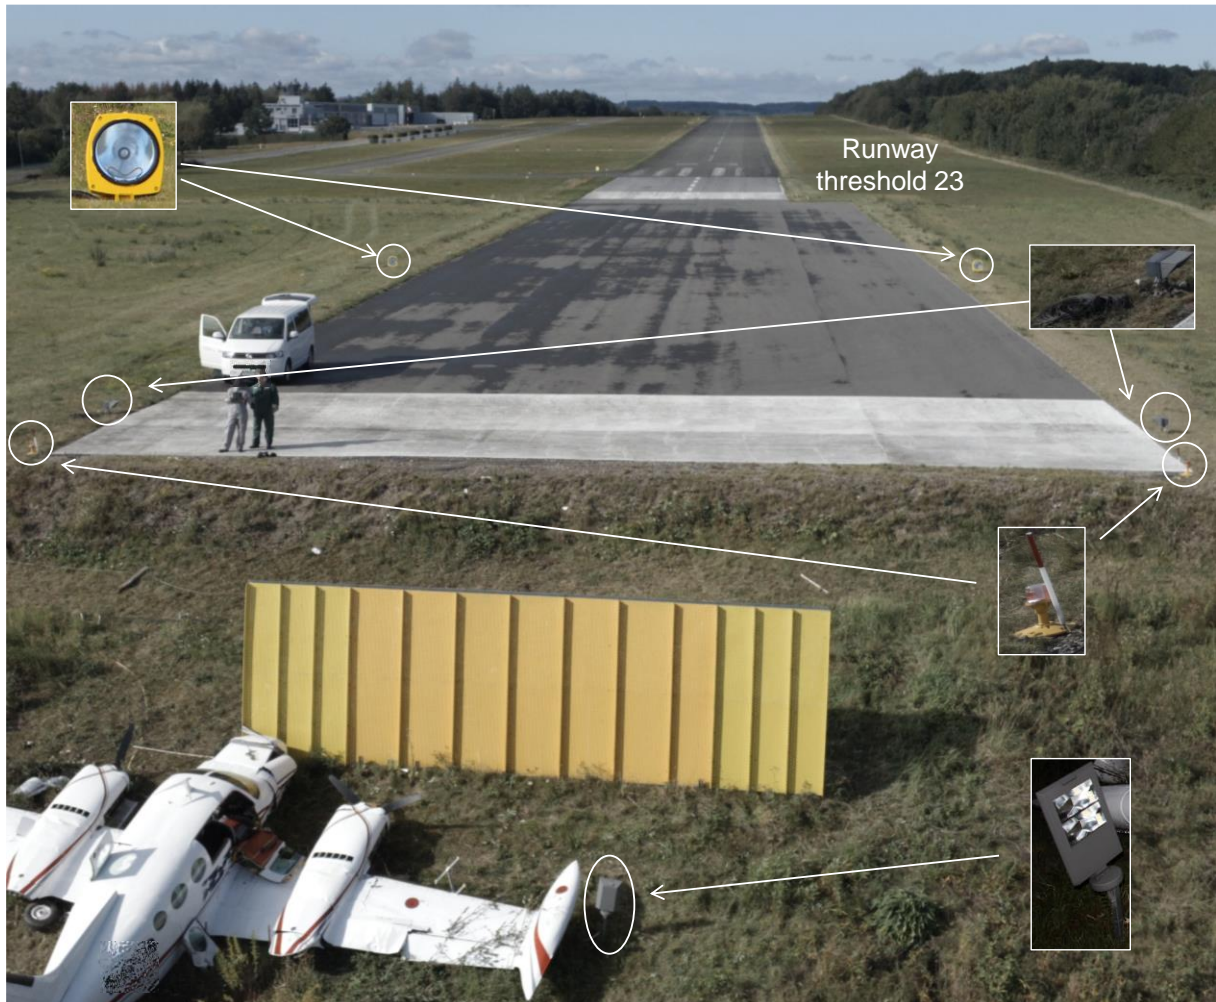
Lighting in front of runway 23 and metal construction at the slope
